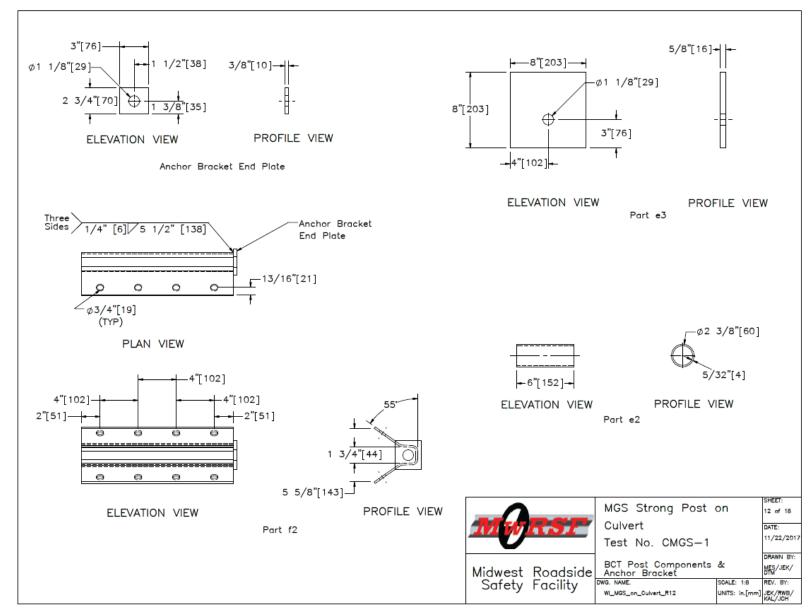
BCT Post Components and Anchor Bracket, Test Nos. CMGS-1 and CMGS-2
